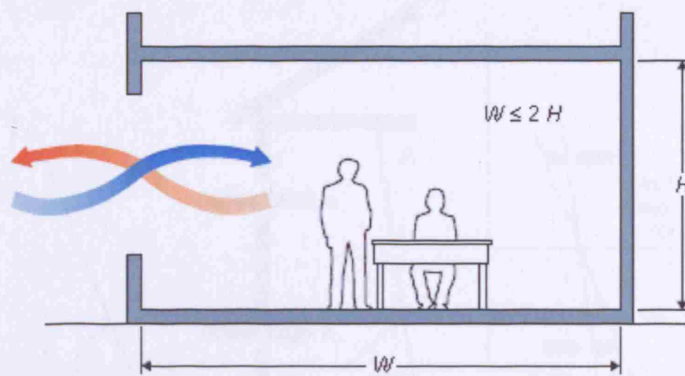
Single sided ventilation, single opening(CIBSE AM10 p. 15)
